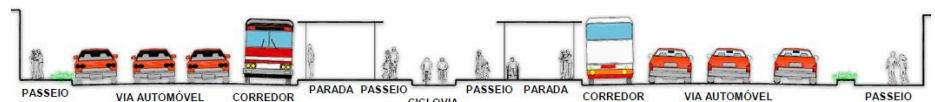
15 Typical Section, segment of Av. Inajar de Souza Bus Rapid Transit system in São Paulo (SPObras, 2014).
